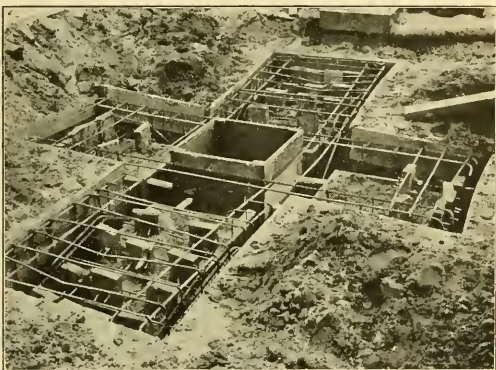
FOOTING OF LAMP STANDARD, SHOWING REINFORCEMENT AND ANCHORAGE
